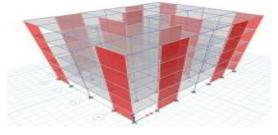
D Modeling of Building with 2.0% shear wall ratio
